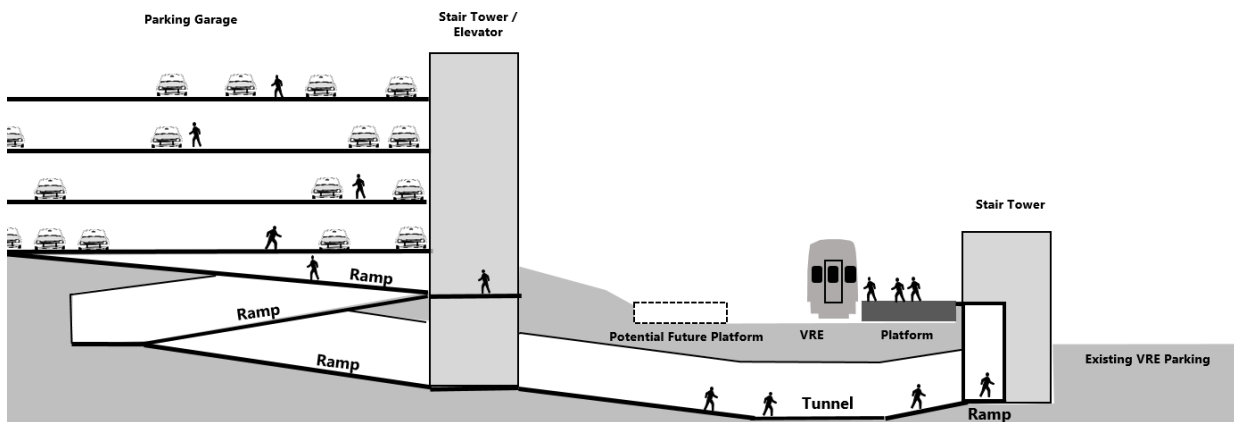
Concept for Pedestrian Tunnel Connection between VRE Parking Garage and Platform
